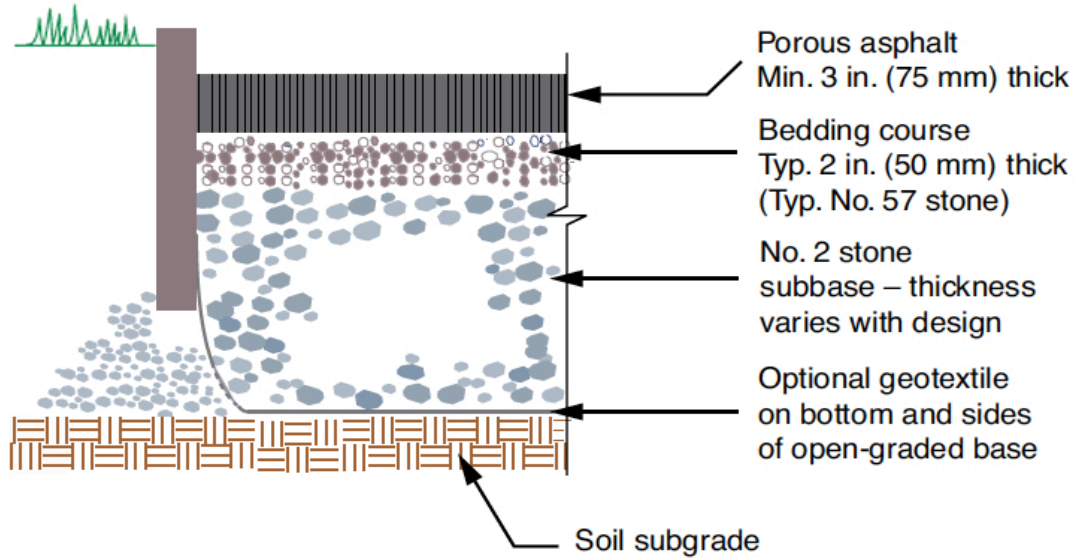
Typical Porous Asphalt Section, *image courtesy of the Interlocking Concrete Pavement Institute.
